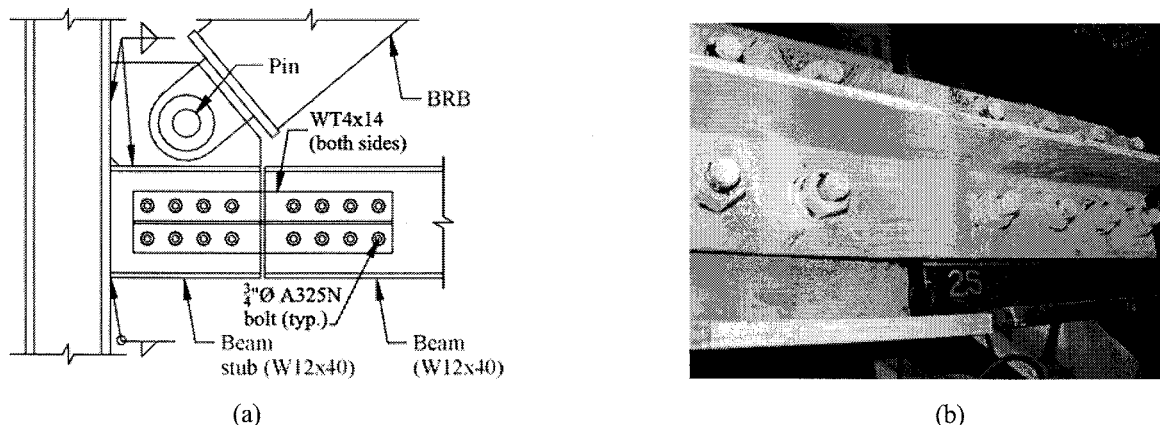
Connection: (a) detail; (b) bolted beam splice after MCE simulation.
